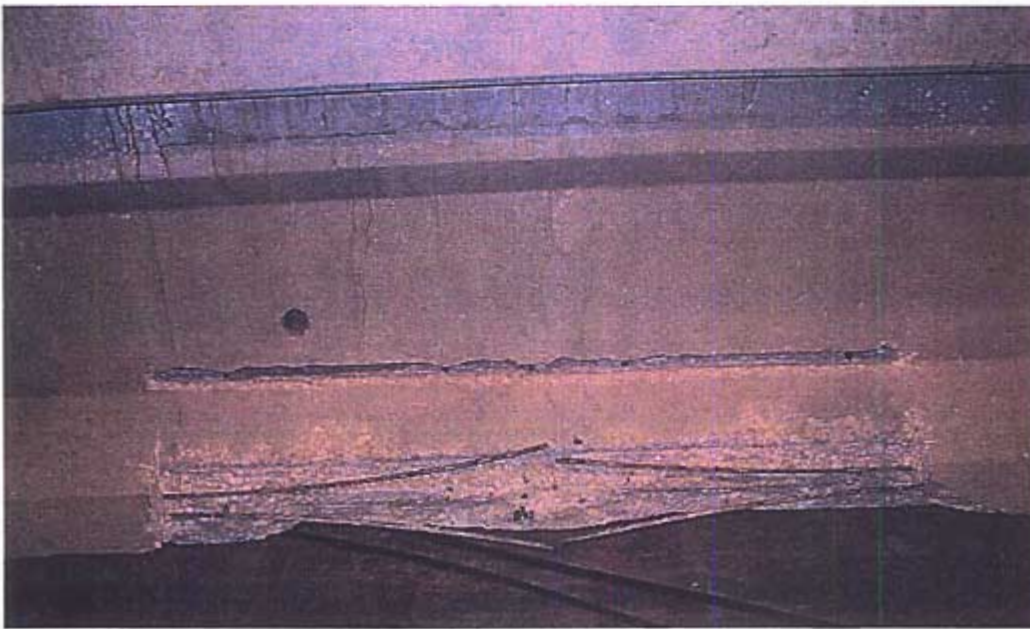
Typical Damage for Test Specimens 2, 3, 4, 5, and 6 Showing Removed Concrete and Two Severed Prestressing Strands
